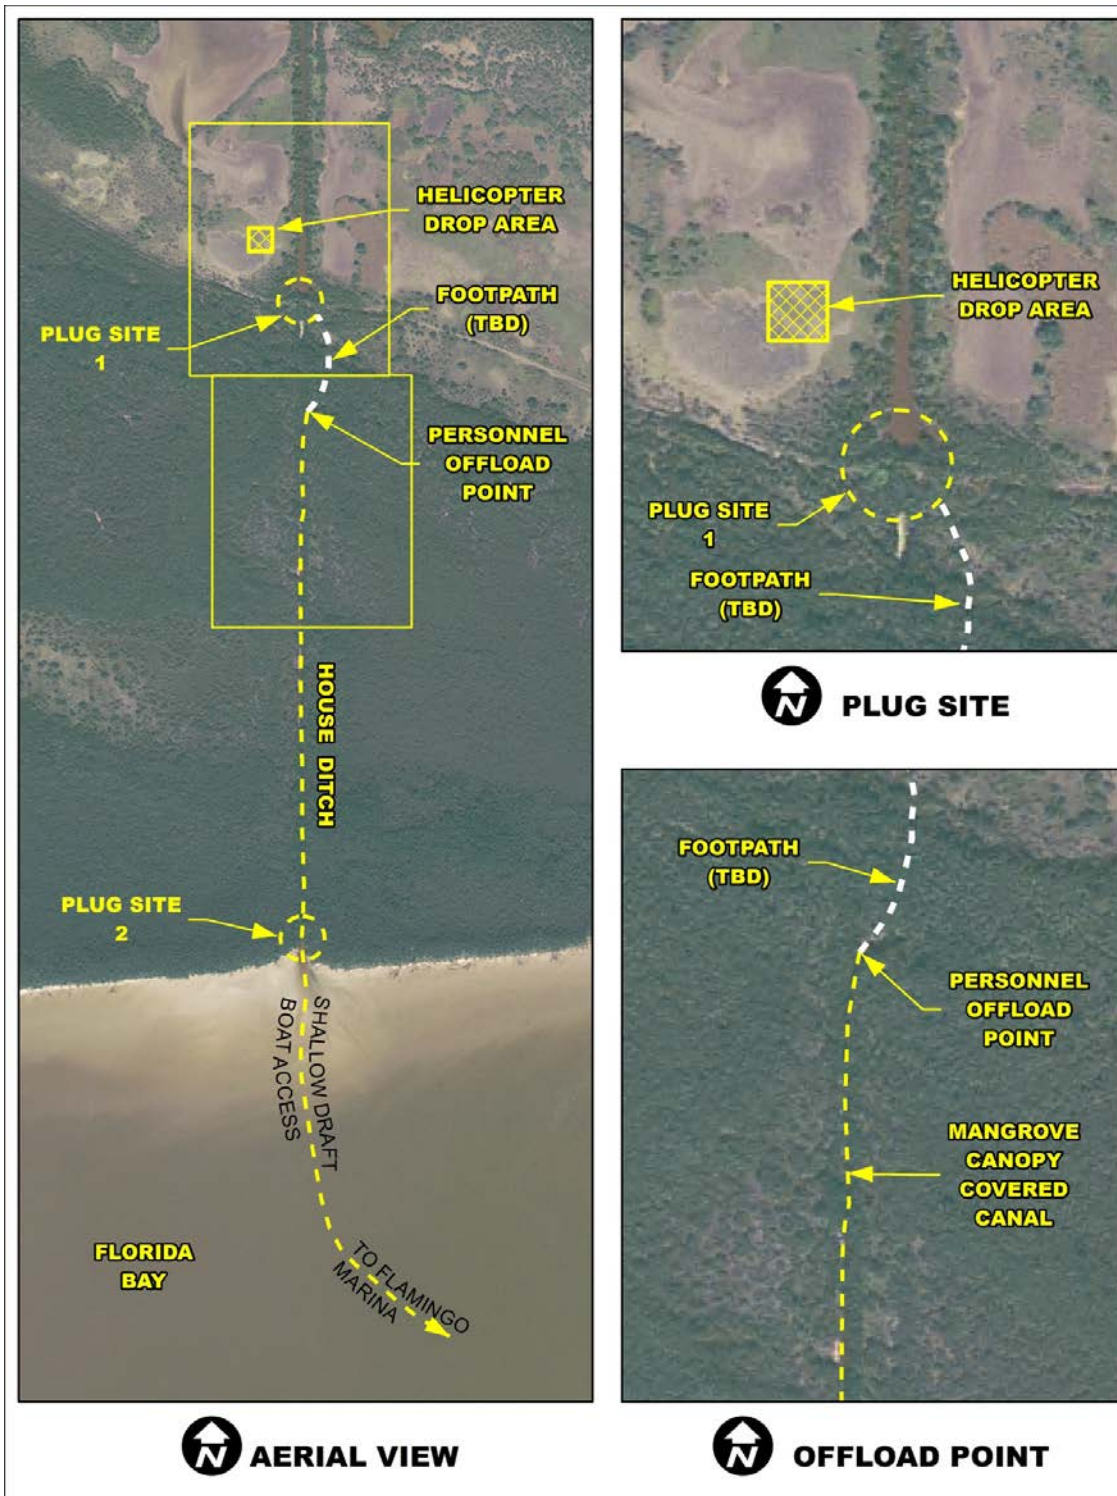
HOUSE DITCH PROJECT SITE
